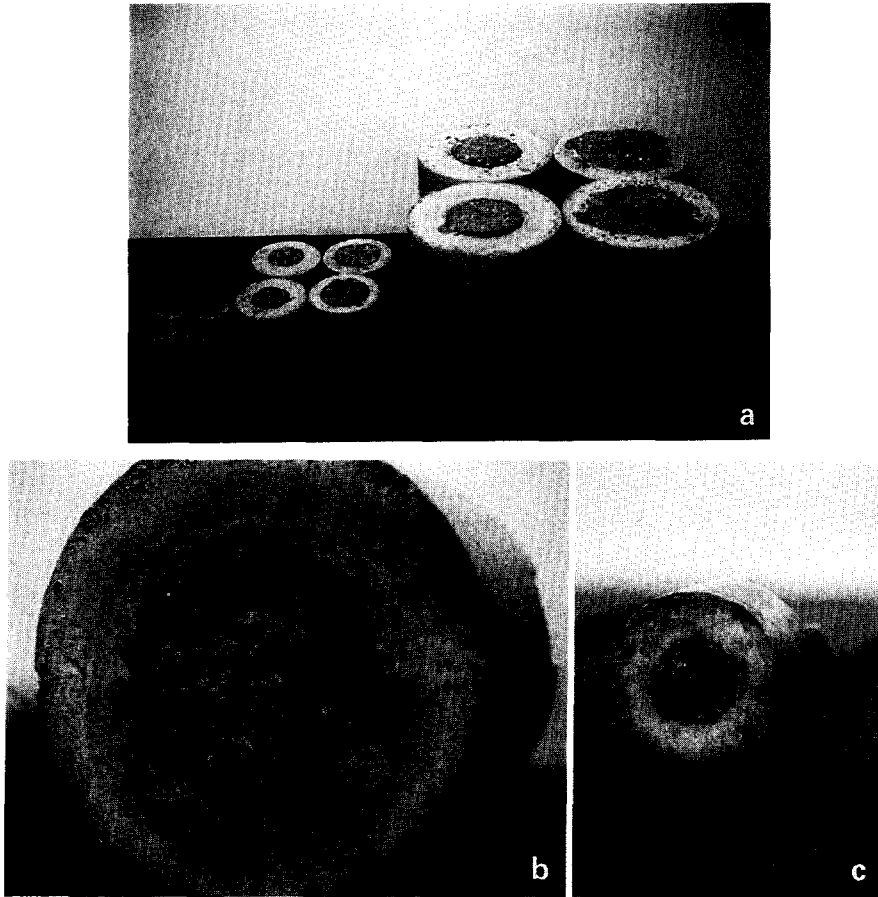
Fractured specimens after the tests, showing the failure surfaces: (a) complete set of specimens; (b) detail of large specimen ( $d = 6$  in.); and (c) detail of small specimen ( $d = 1.5$  in.).
